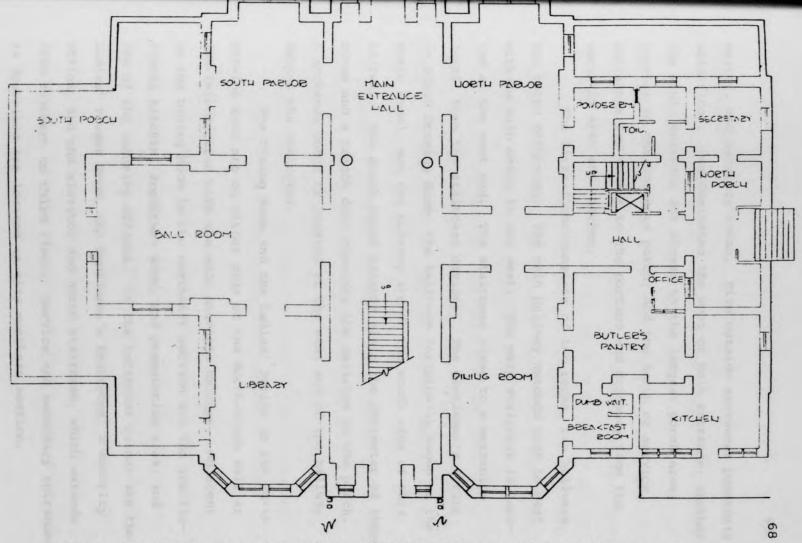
First Floor Plan Before 1974-76 Renovation and Partial Restoration
